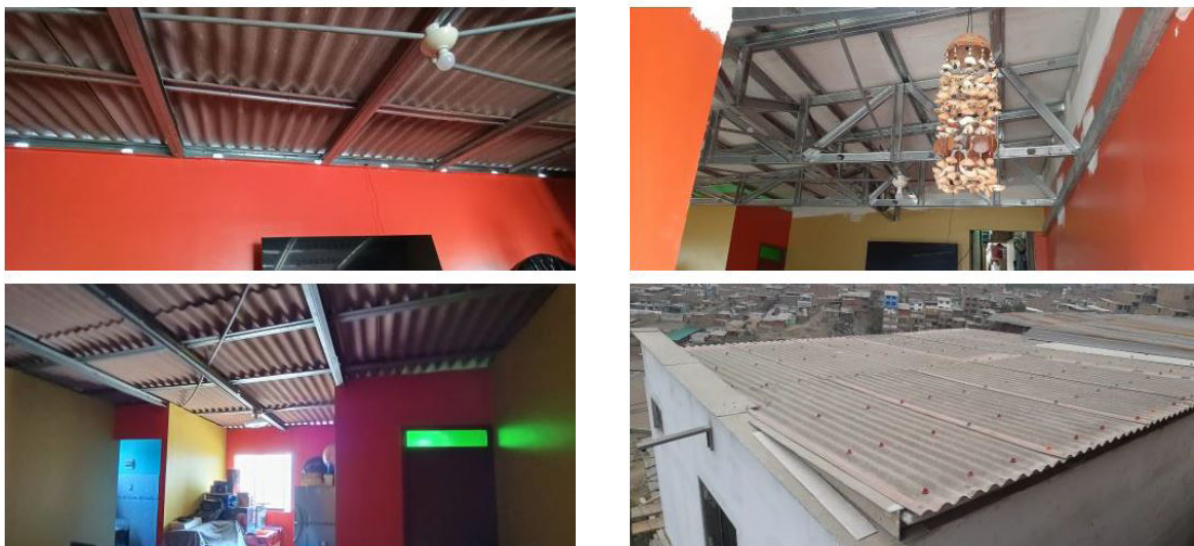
Roof details before retrofit (left) and after the installation of the insulation (right).
